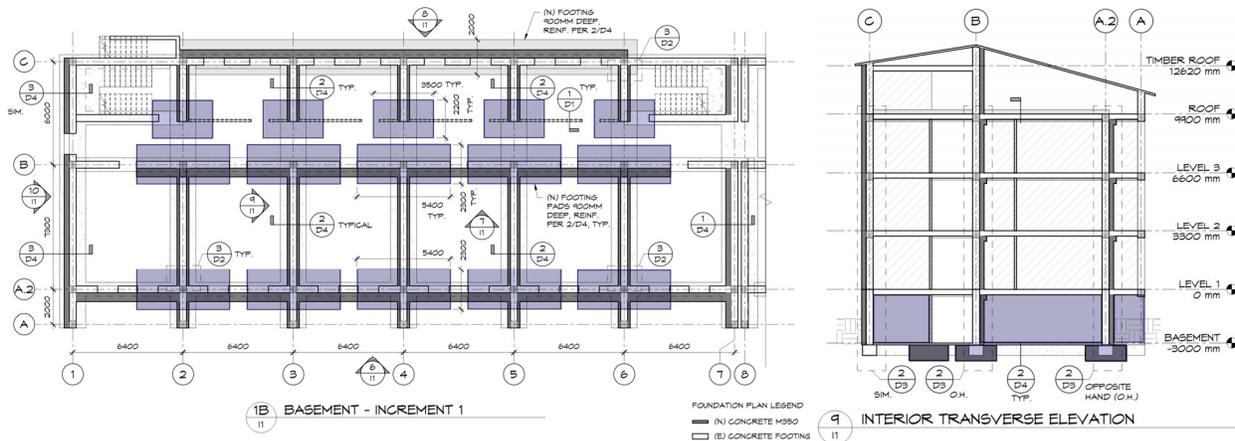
New augmented footings shown in plan and section. The lower transverse walls have been strengthened.
